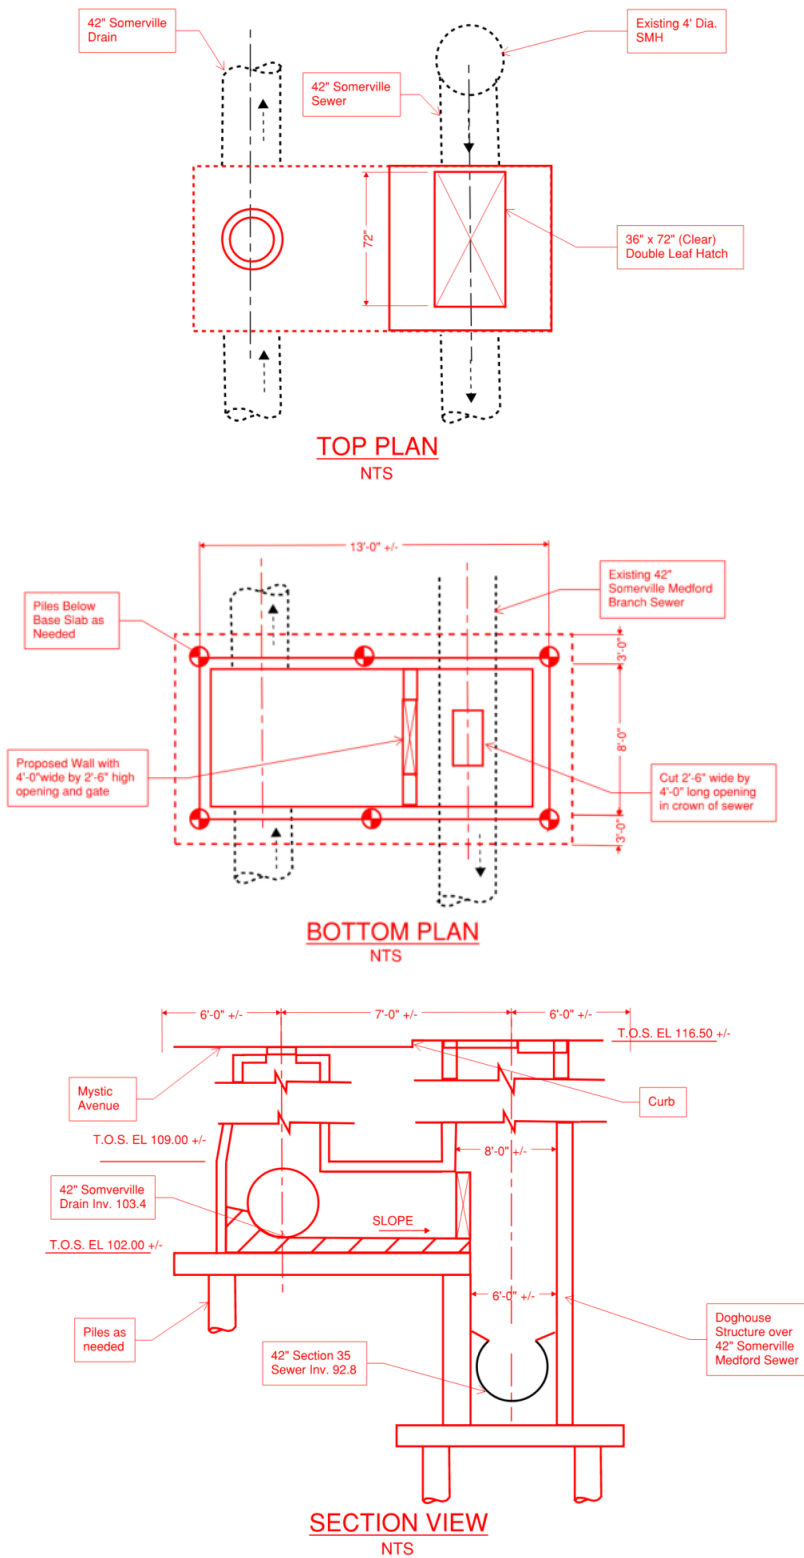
Alternative 2.3 Chamber Plans and Section
